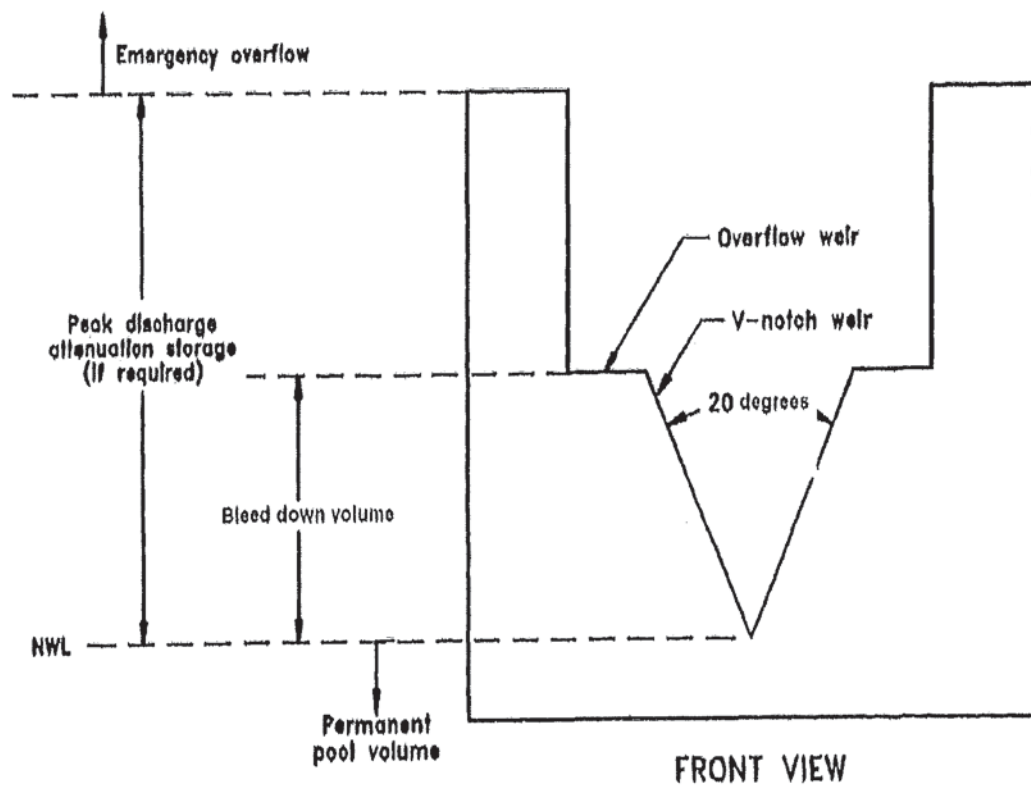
Typical Wet Detention Outfall Structure with "V"-notch Weir (N.T.S.)
